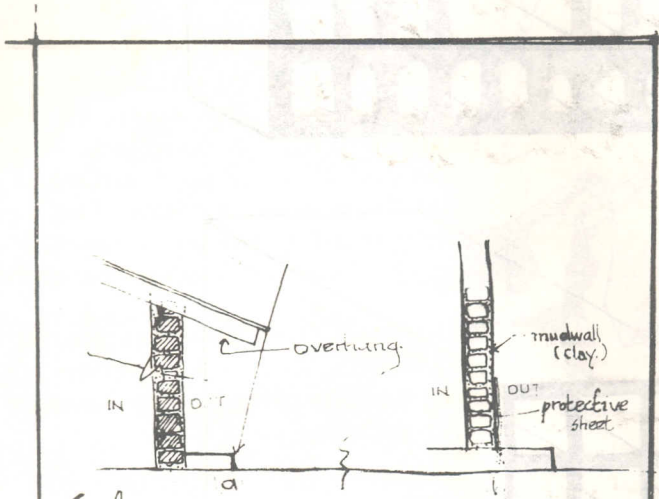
a&b Showing wall protection by overhang and metal sheet.
